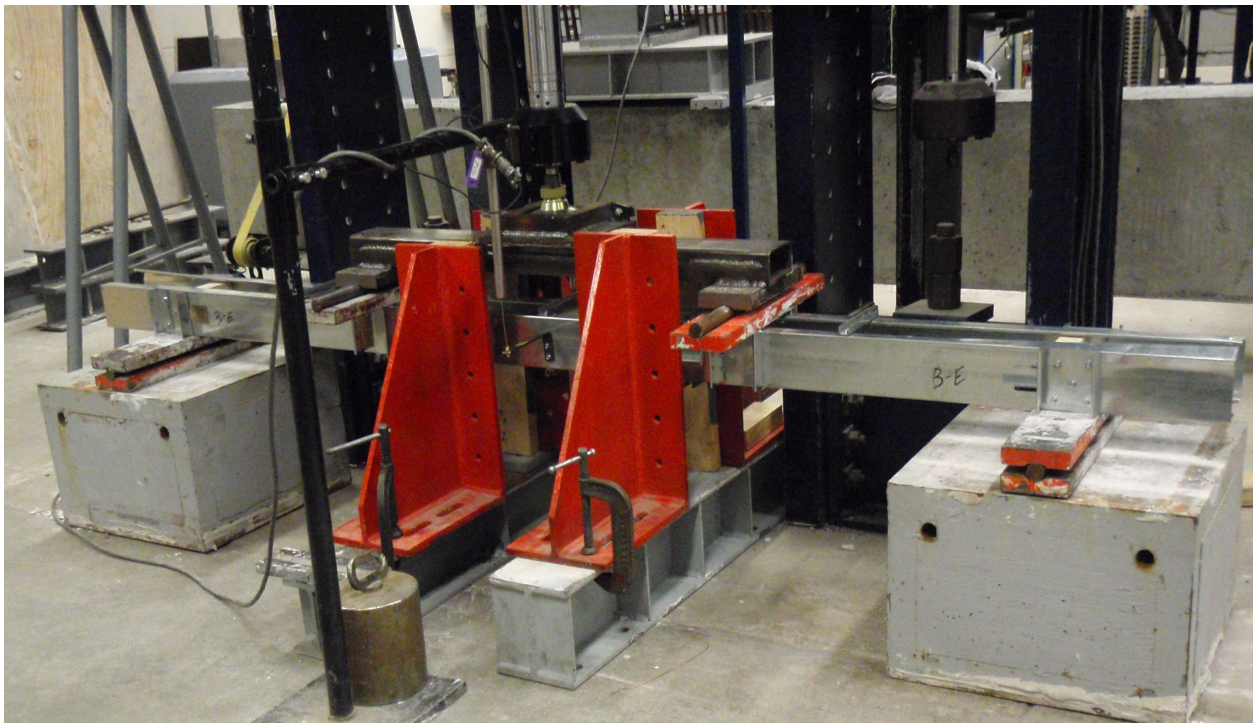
Shortened 3 3/8" Specimen being tested.
